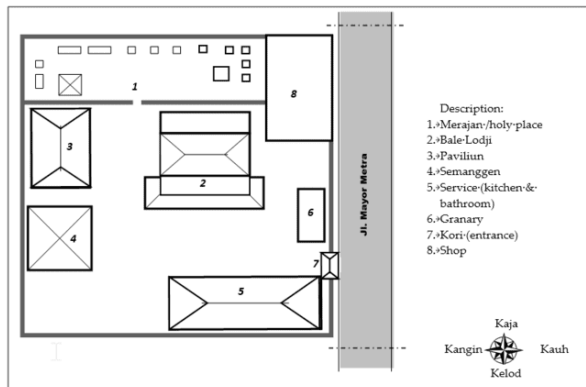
Site plan of Geria Sukasada on Jalan Mayor Metra No. 98
